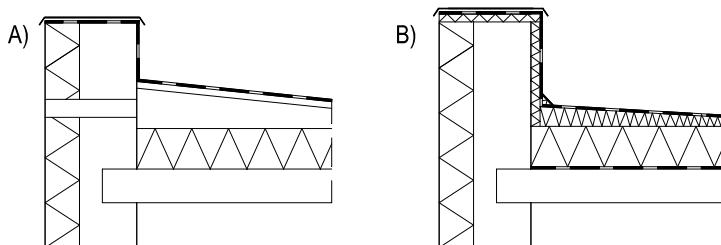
Examples of a ventilated roof and a flat roof with tapered layers (Source: own elaboration)
